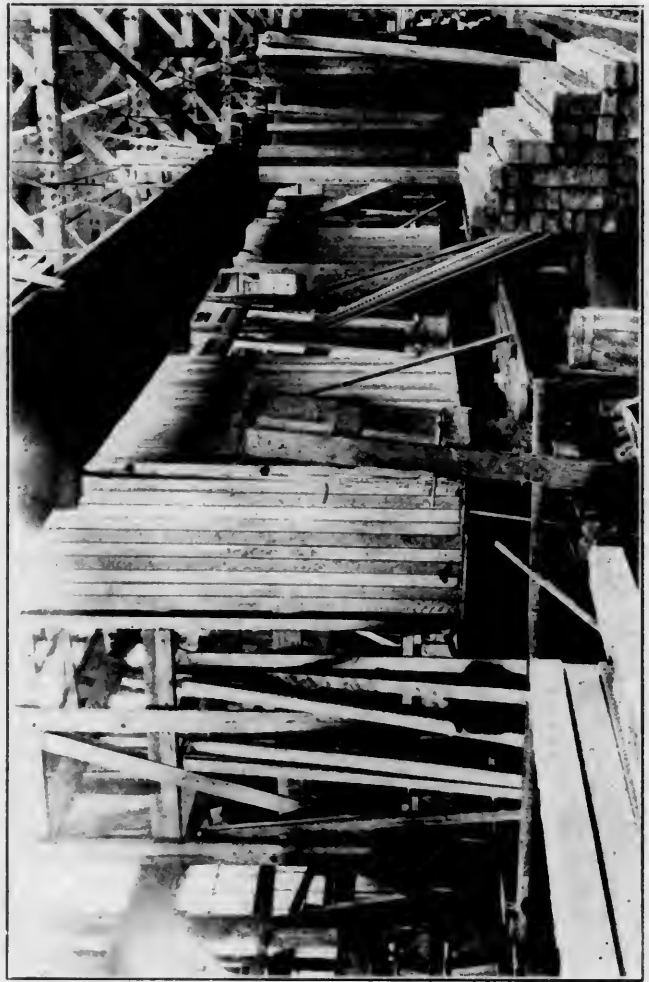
FOURTH STAGE—THE ROOF FRAME IS ABOUT TO BE RAISED
